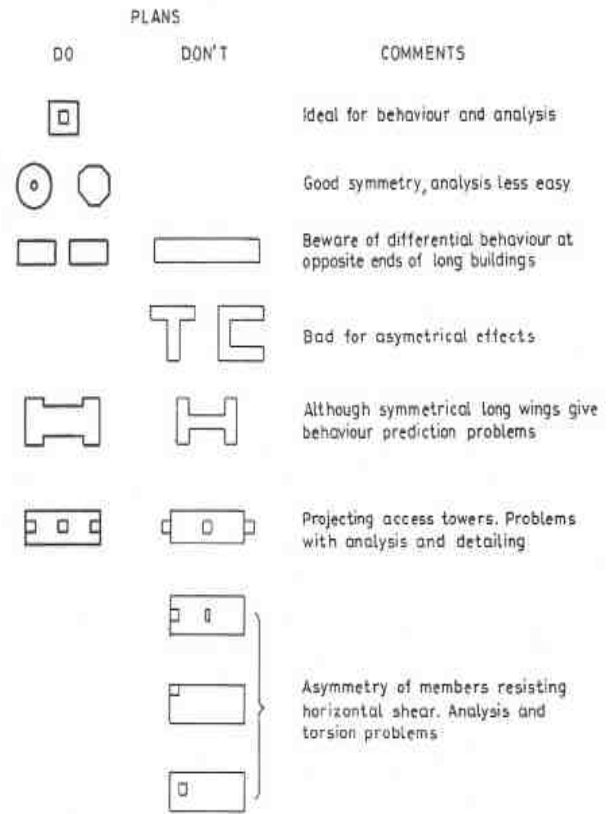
Simple rules for plan layouts of aseismic buildings.
